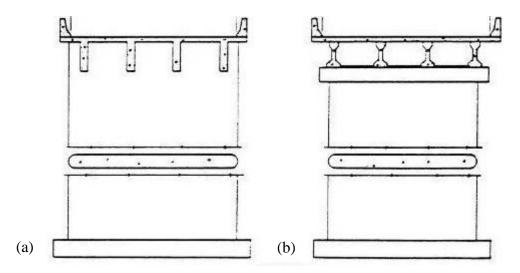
Solid Wall Piers (a) monolithic with superstructure, (b) non-monolithic with superstructure
